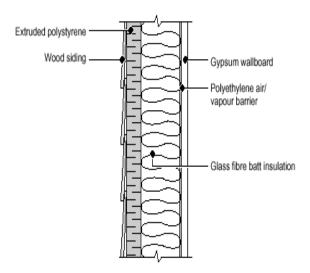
Stud Walls with Exterior Thermal Sheathing.
